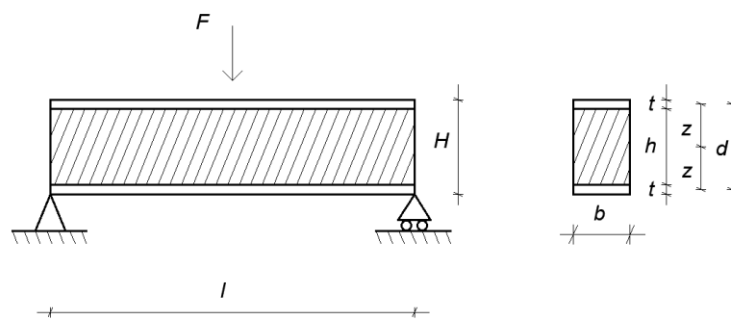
Sandwich Beam full core schematization (left) - Cross Section (right)
